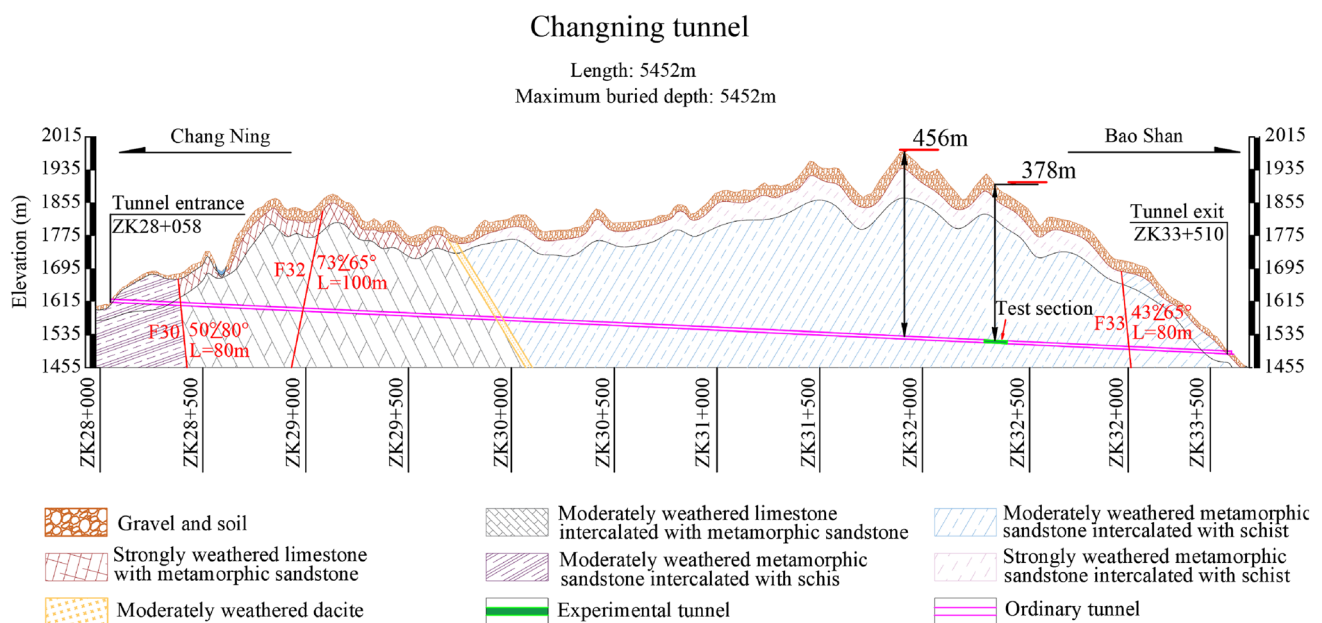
Longitudinal geology profile and test section of the Changning Tunnel
